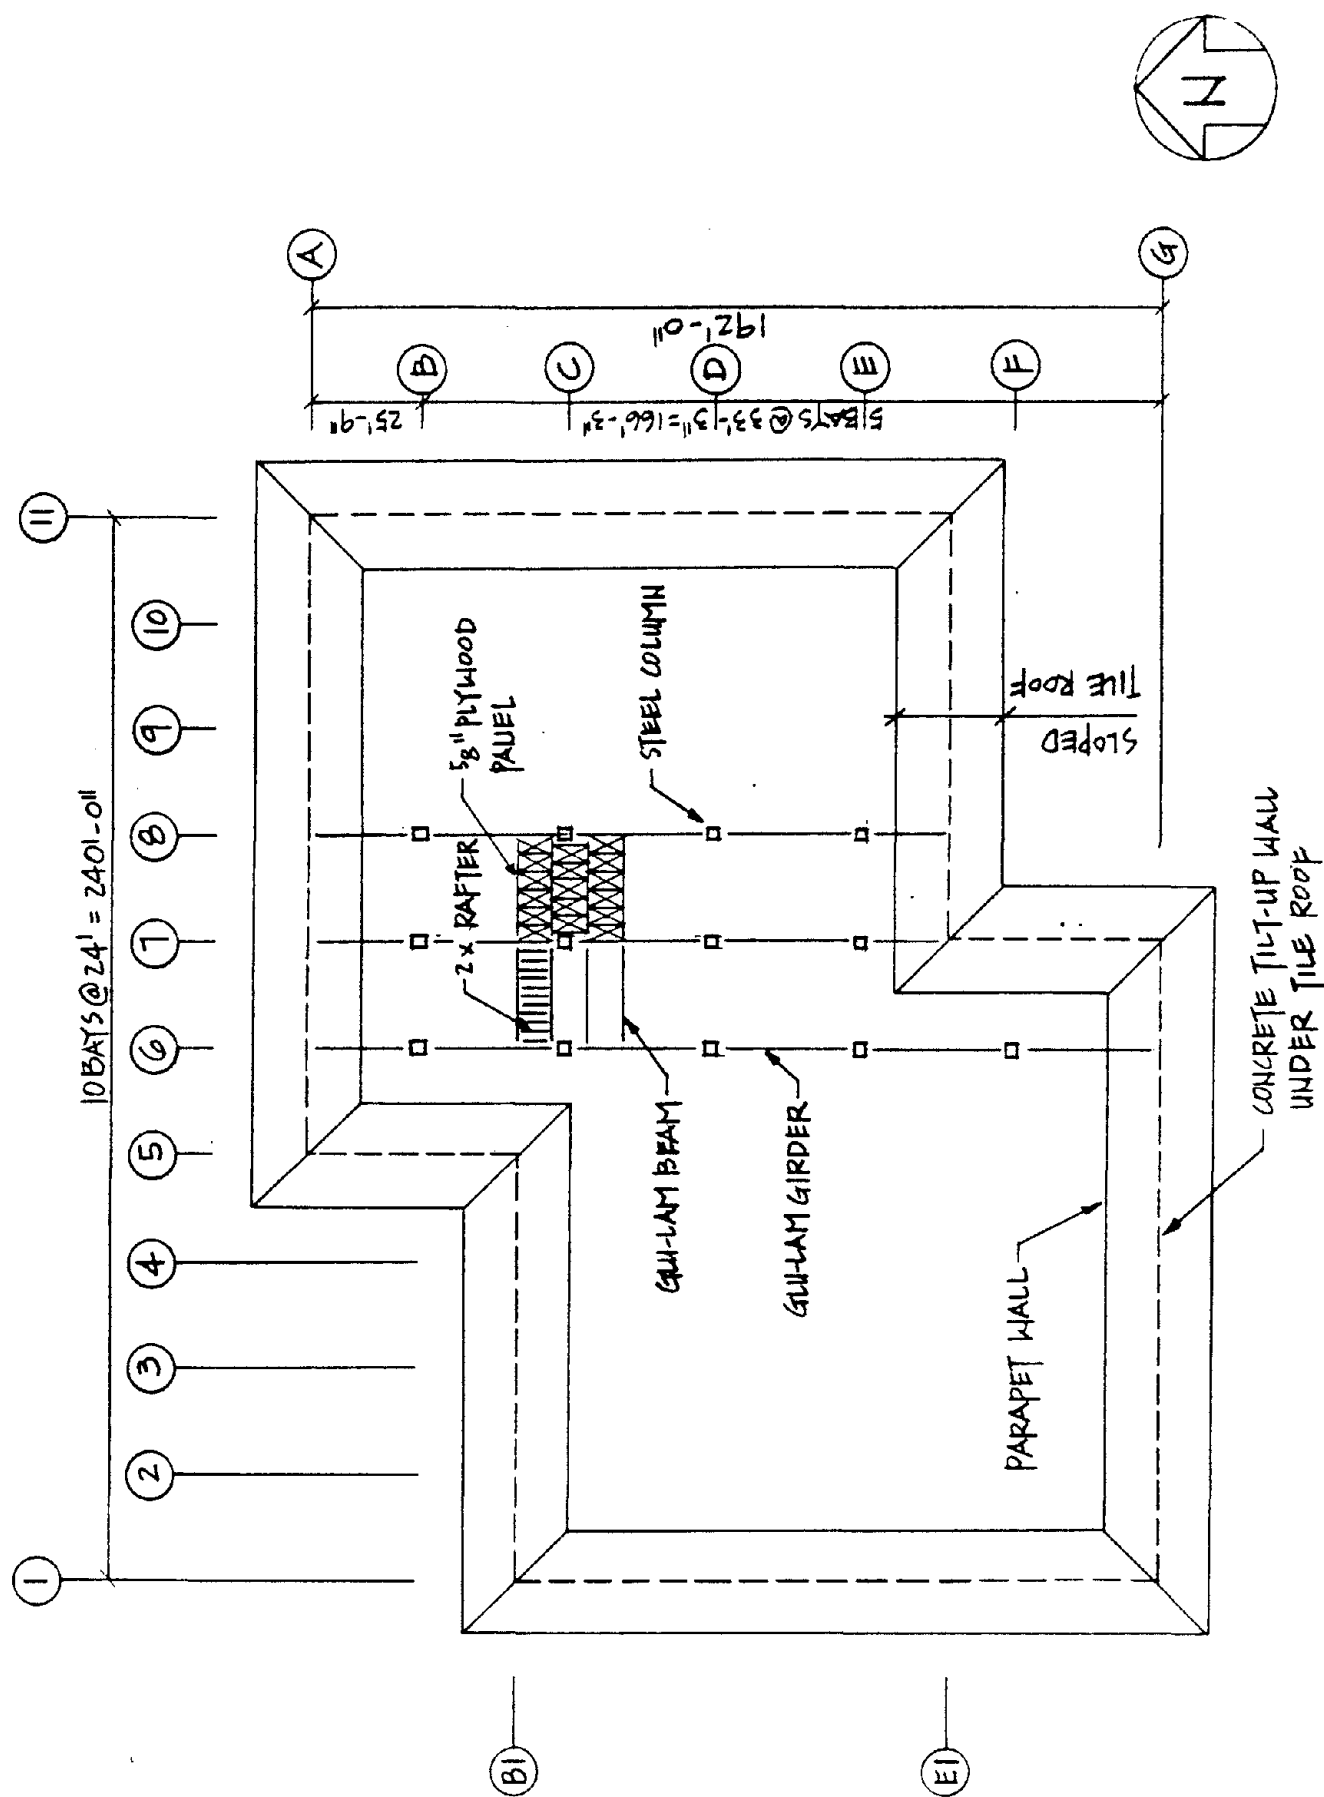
Roof Plan of the 490 Jarvis Drive Building
